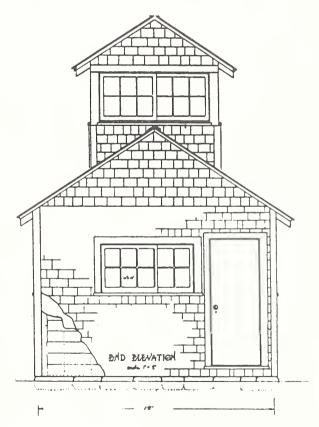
Frame lookout house, Plan L-2, 1928. This style was designed in the Northern District (Region 1).
